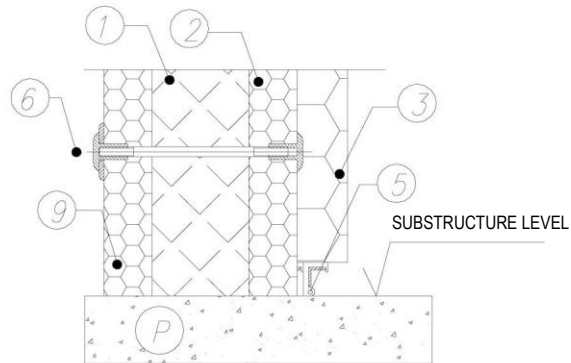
INSTALLATION OF COLD ROOM DOORS WITHOUT A THRESHOLD TO CONCRETE FLOORING
